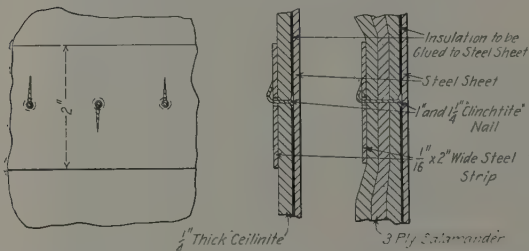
Method of Fastening Insulation by Electric Spot Welding and Clinchite Nails. H. W. Johns-Manville Company.
